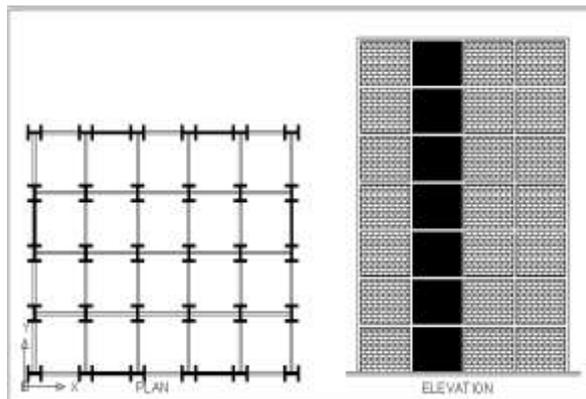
Building with Steel Plate Shear Wall in Zone V (Model II)
